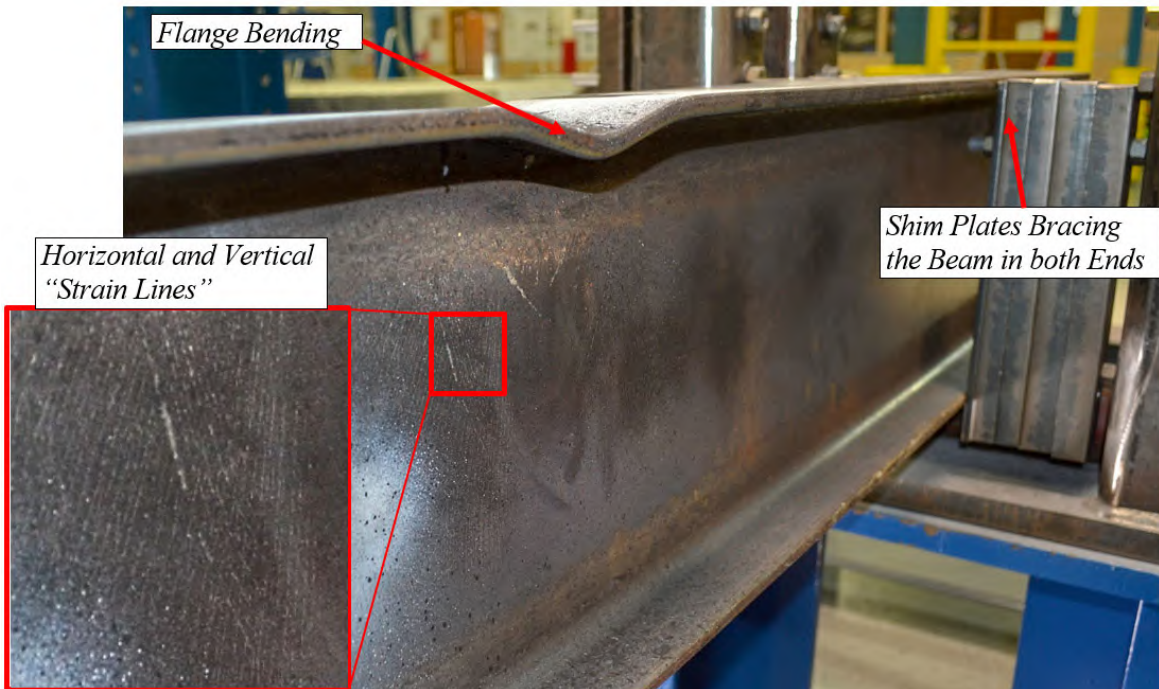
Elevation of W10X19-SC-NA after testing
